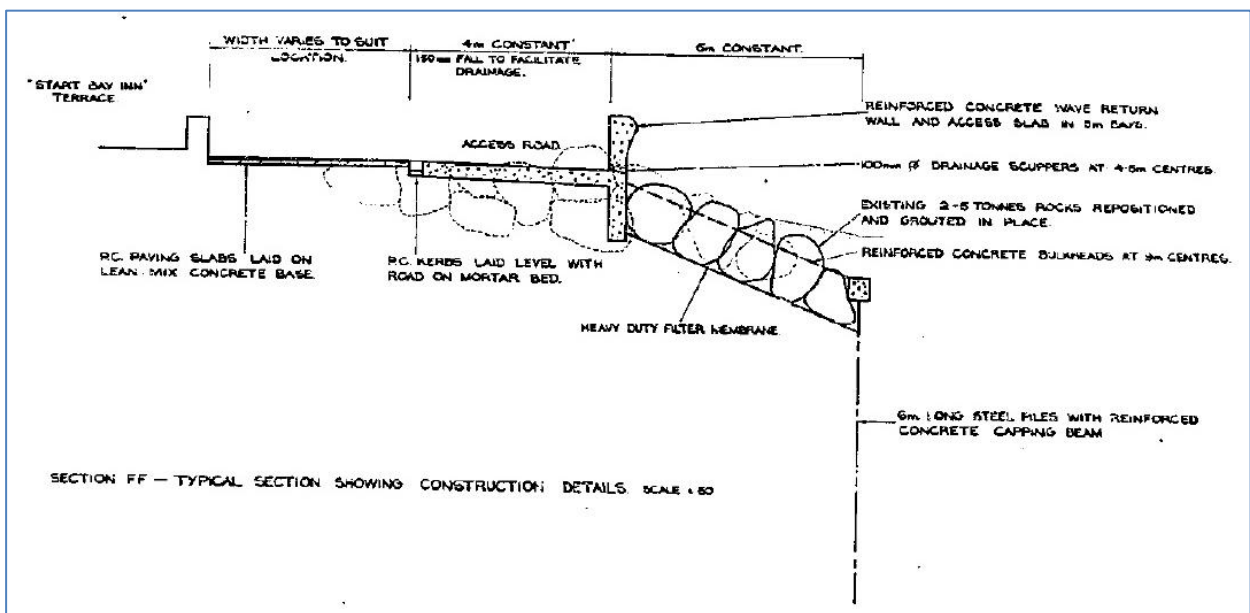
Selected details of the seawall and promenade fronting Torcross Beach
